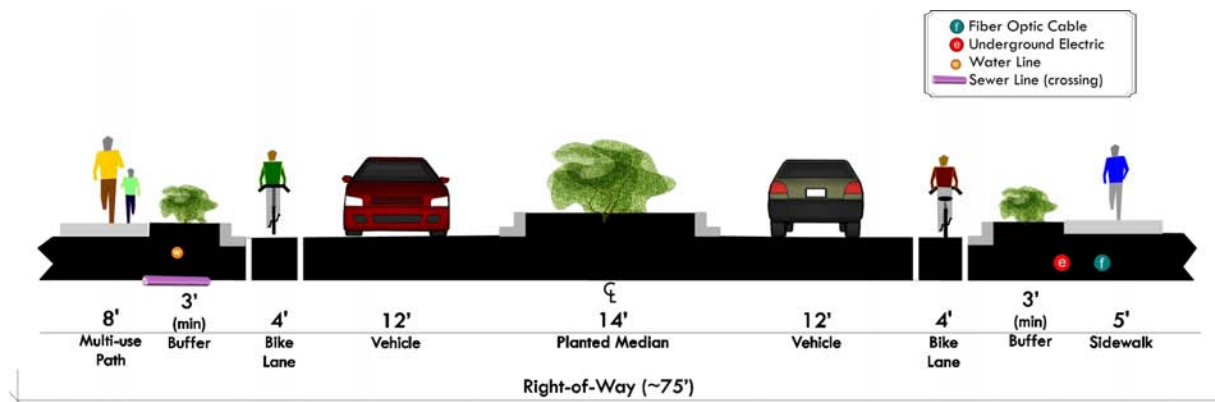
Recommended Church Street Ultimate Cross-Section
